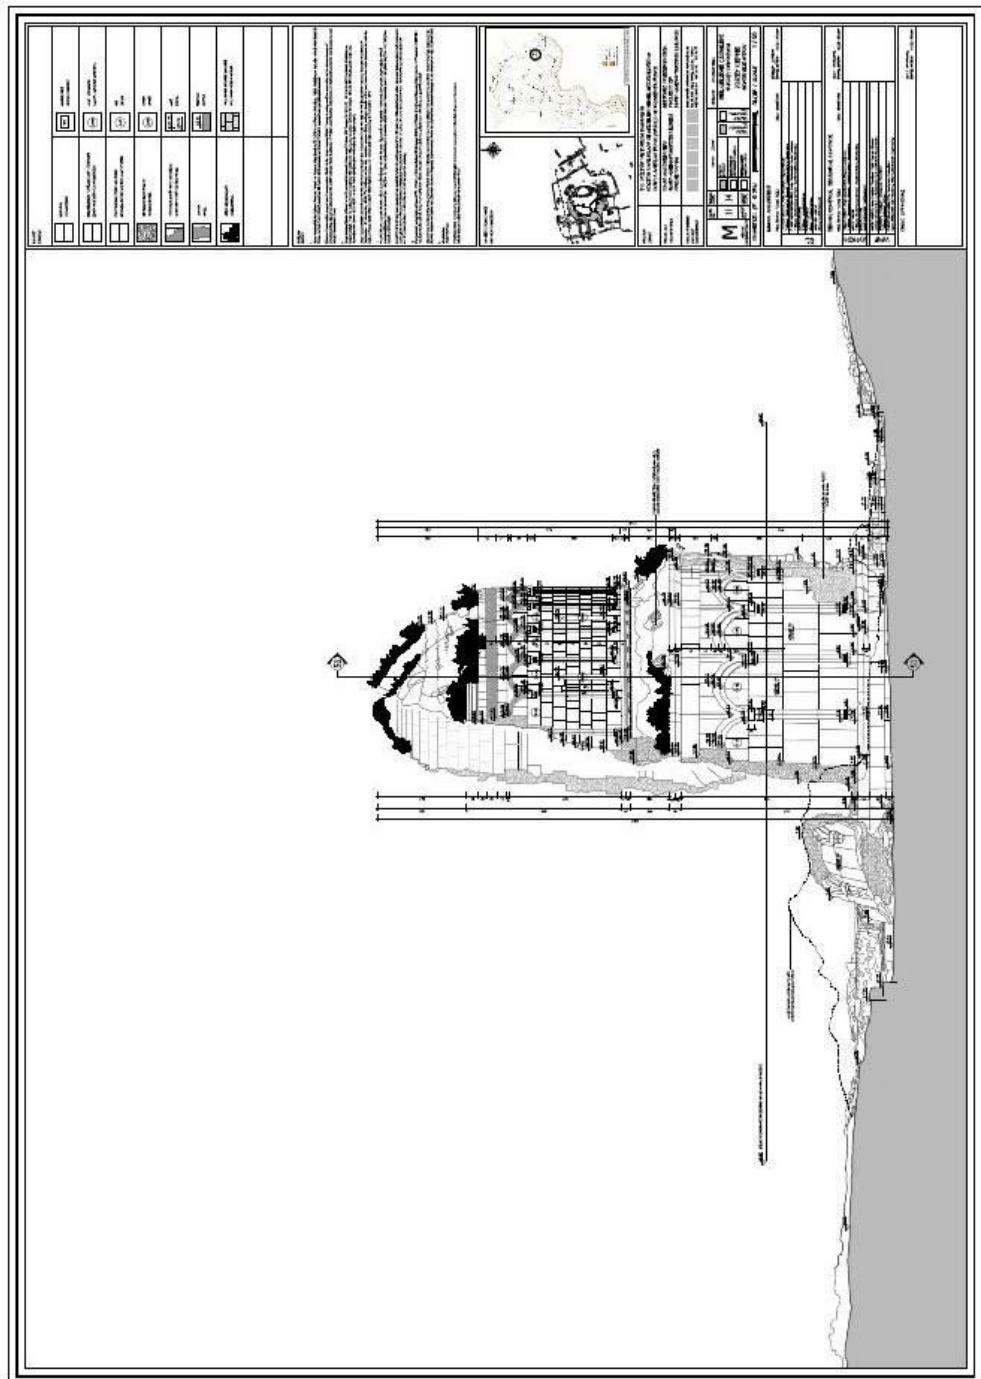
North Elevation, Historic Preservation Project of Surb Amena P'rkich Church, Promet Proje Ltd.Şti. 2012
